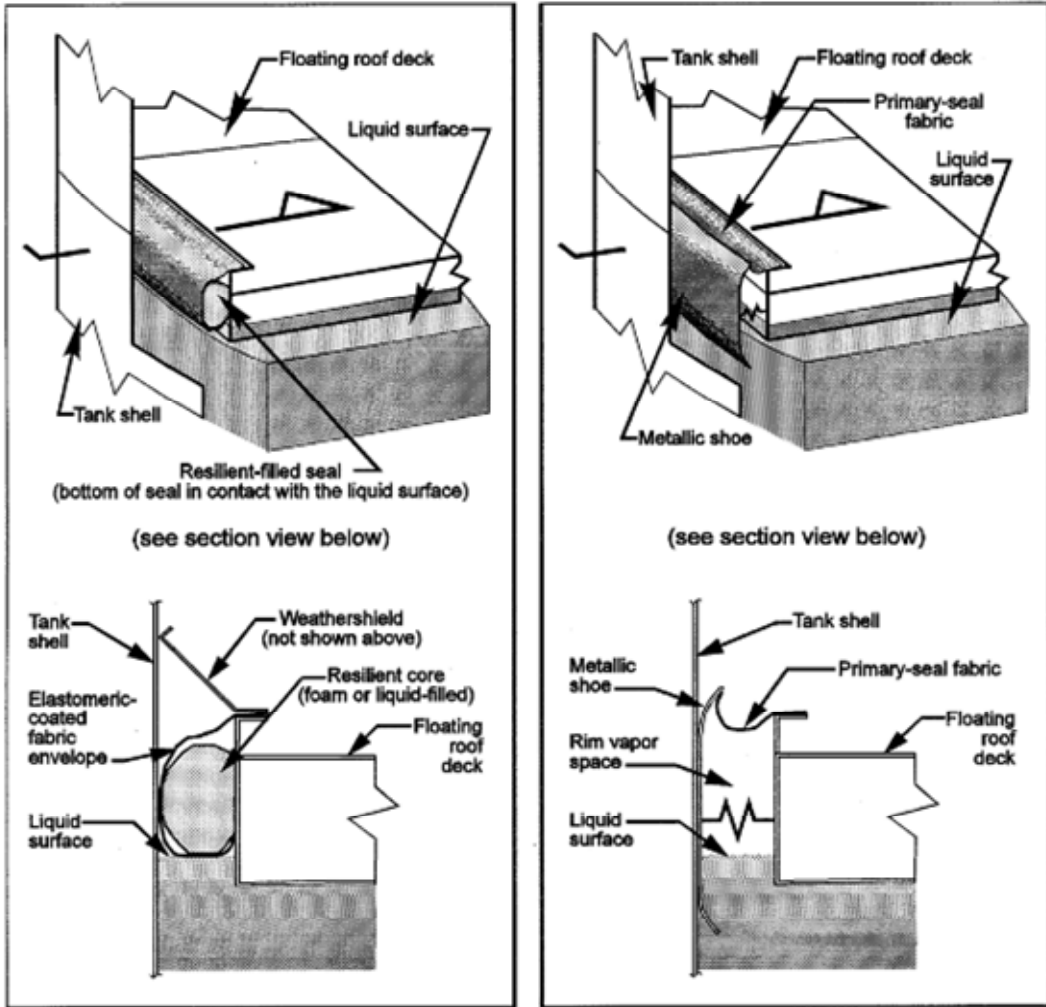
Liquid-mounted and mechanical shoe primary seals<sup>11</sup>.
